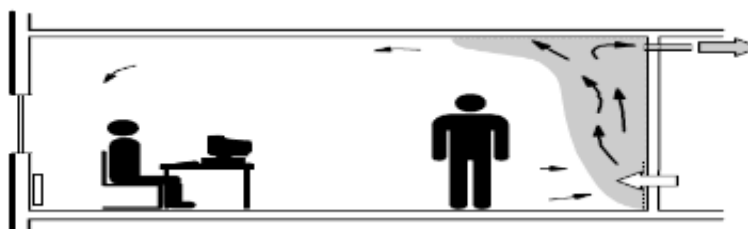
Replacement ventilation do not work when the supply air is warmer than the space air
